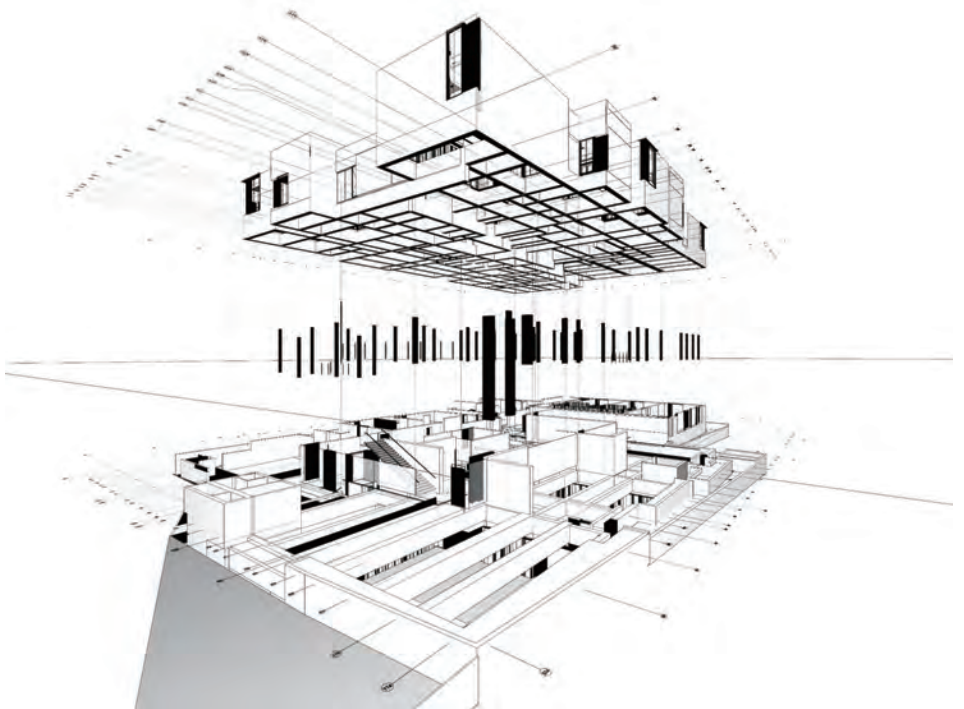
No. 1 Building of Toho Gakuen Chofu Campus
